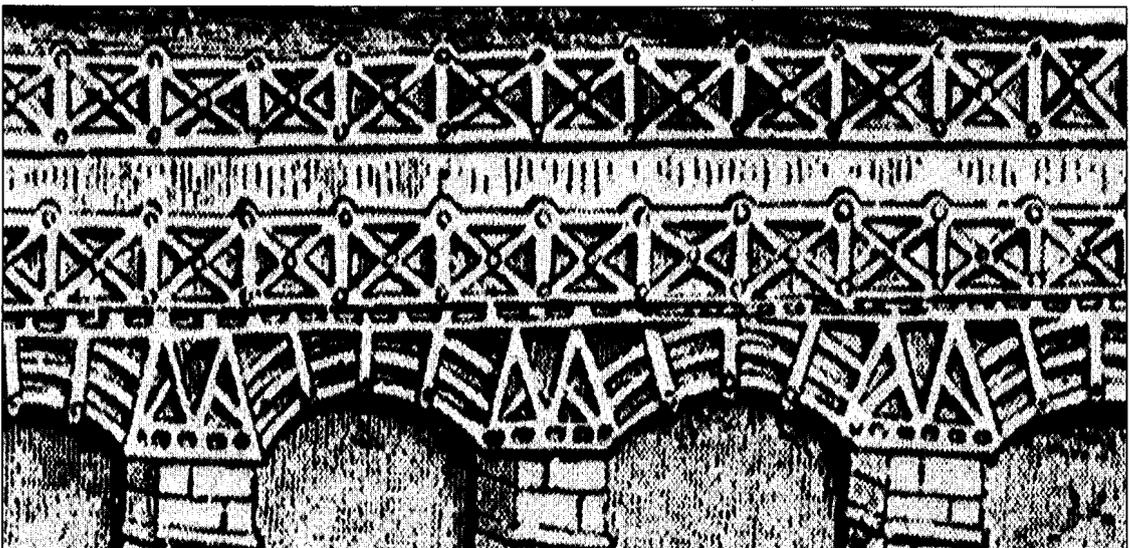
A close-up of Trajan's Bridge showing the central portion of the bridge.
